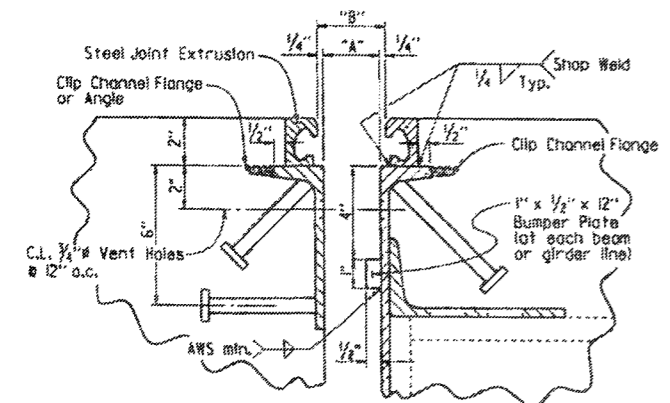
DETAILS FOR BLOCKING EXPANSION JOINT DEVICE
